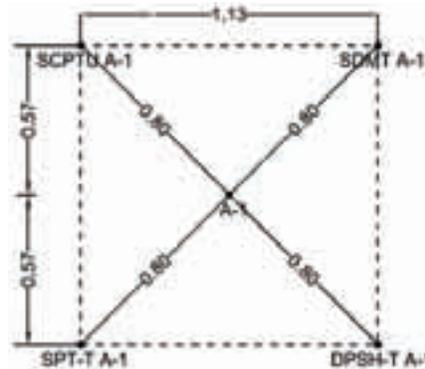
Example of layout of tests performed adjacent to Pile A-1.
